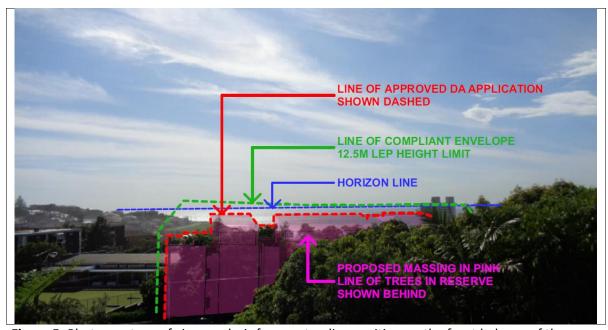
Photomontage of view analysis from a standing position on the front balcony of the existing dwelling house at 22 Clarendon Street, showing building massing of the approved development, as proposed to be modified, in pink (Source: MHNDU)
